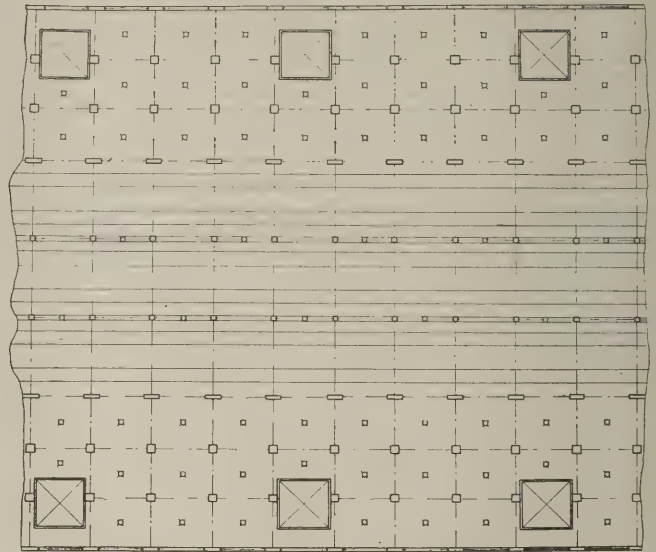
Plan of Loading Platforms and Tracks Showing Location of Lighting Units
